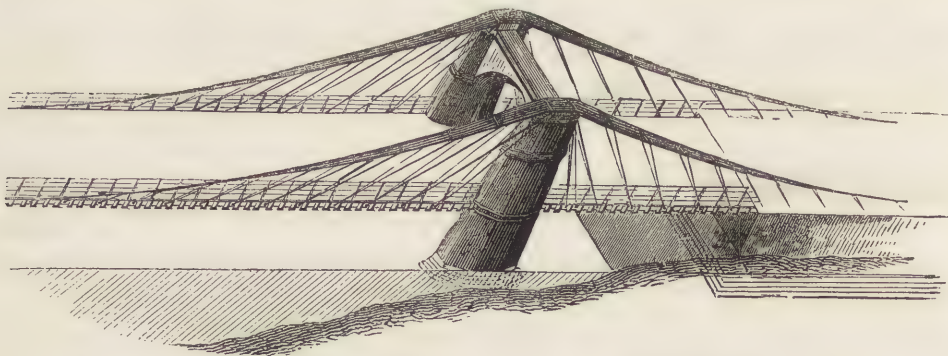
ISOMETRICAL VIEW OF ONE HALF OF A SUSPENSION BRIDGE ON MR. DREDGE'S PRINCIPLE.
